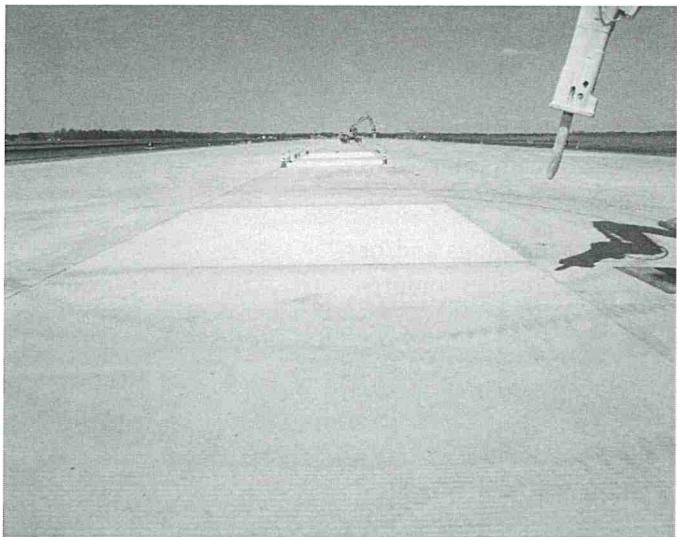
shows examples of completed cast-in-place FDRs at airfield facilities.
